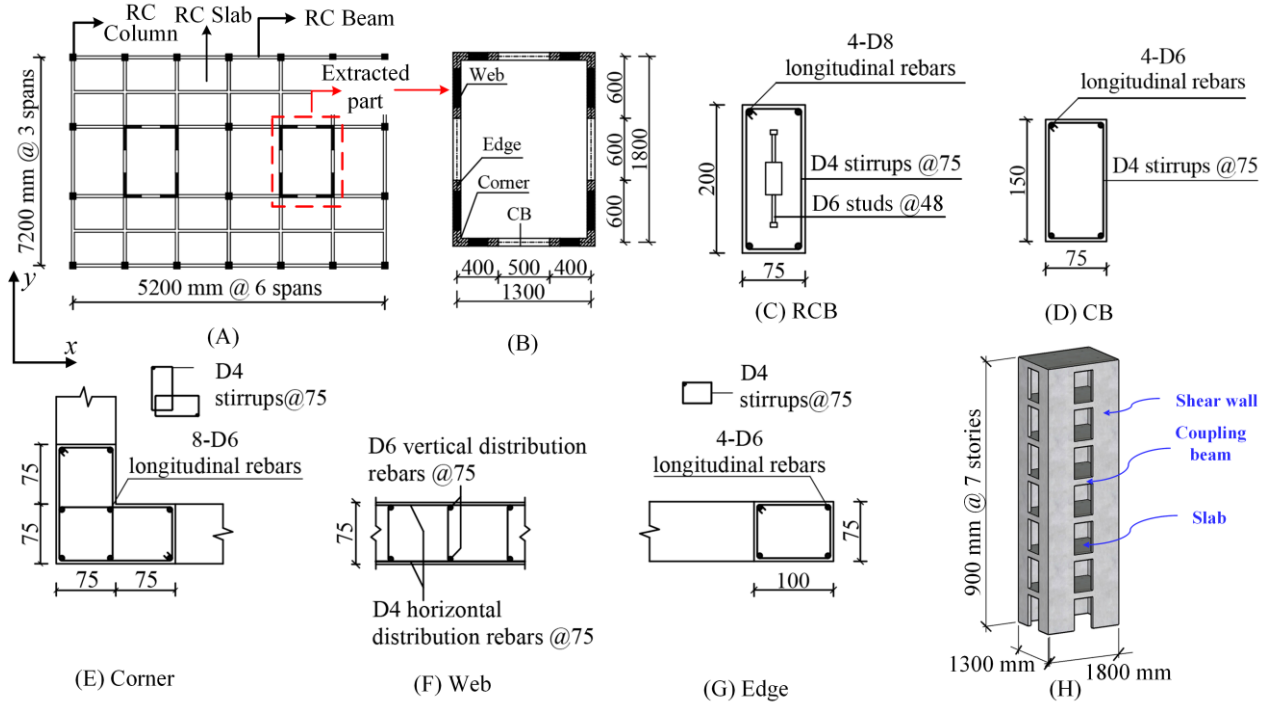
(A) Plan view of the prototype case study building; (B) Plan view of the coupled shear walls specimens; (C) to (G) Cross-sections and reinforcement details of the non-replaceable beam segment of the Replaceable Coupling Beams (RCBs), of the Coupling Beams (CBs), of the Corners, Webs and Edges; (H) Elevation view. [units in mm].
